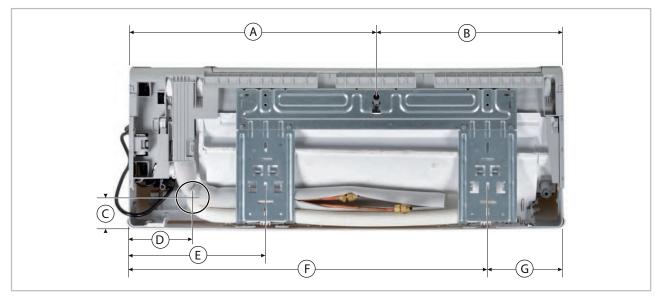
Wall bracket mounting points RVT 264-684 DC (rear view)
